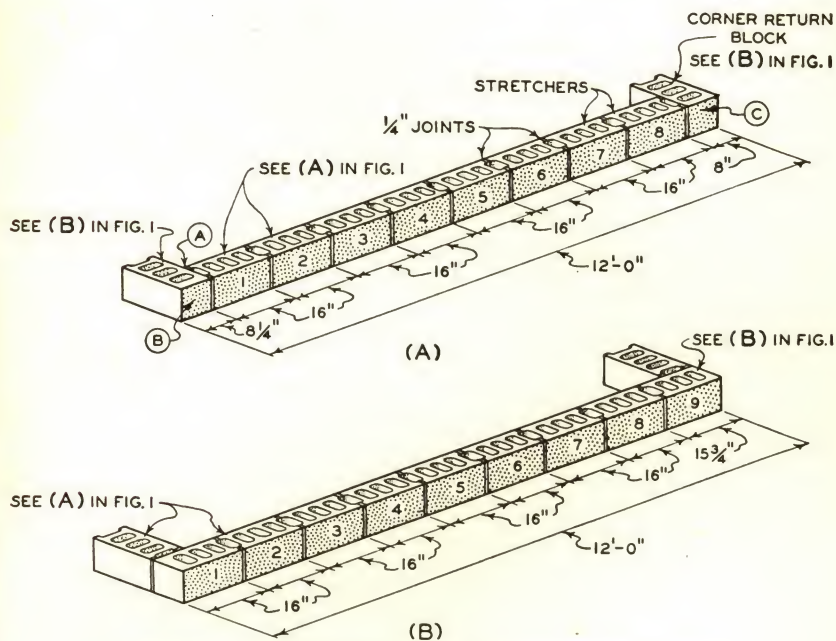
First and Alternate Courses of a Well-Planned Block Wall
